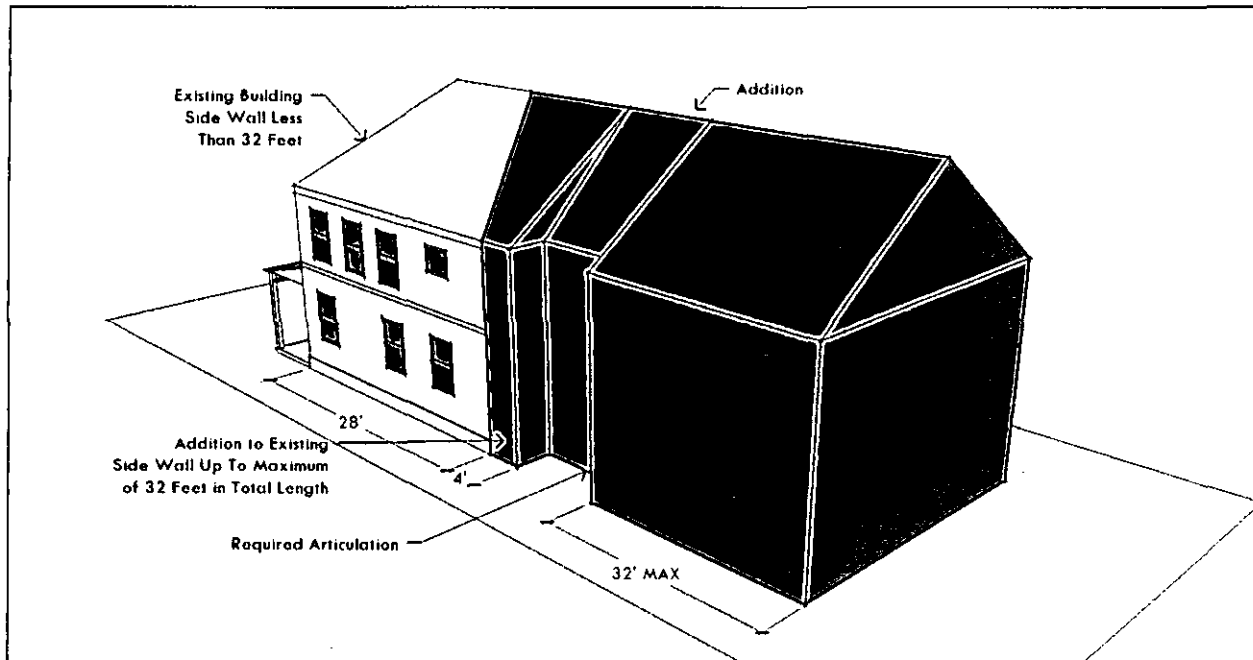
Side Wall Articulation (Existing Side Wall Less Than or Equal to 32 Feet)
